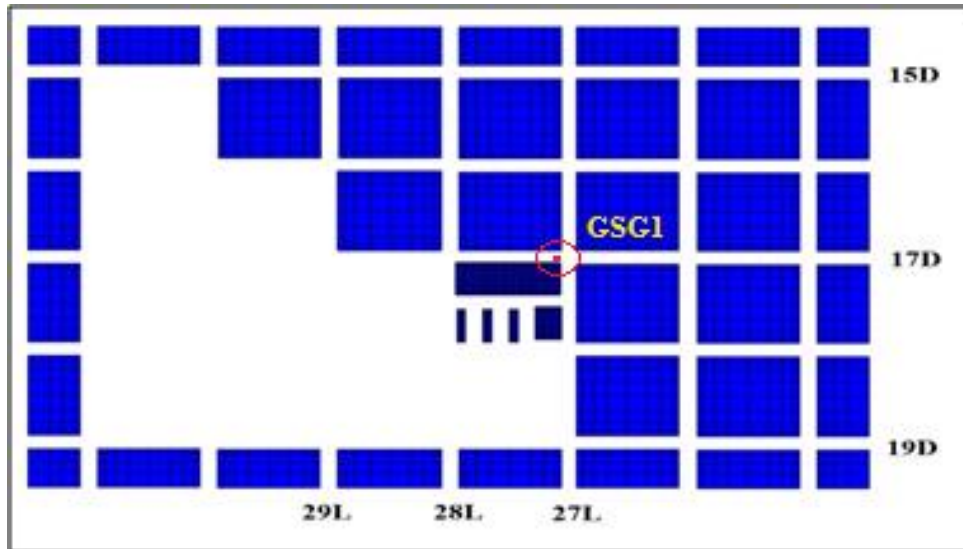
Bord and Pillar no. 31 at GDK-5A, Incline, SCCL with instrumented rock bolt location GSG1
